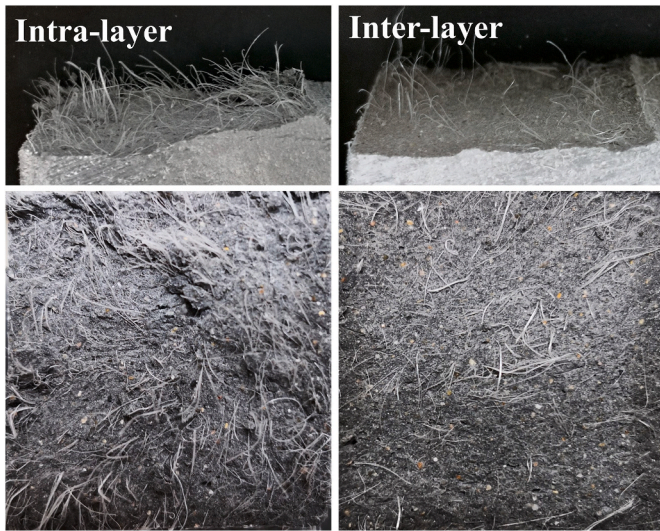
Fracture surfaces of intra- and inter-layer samples.
